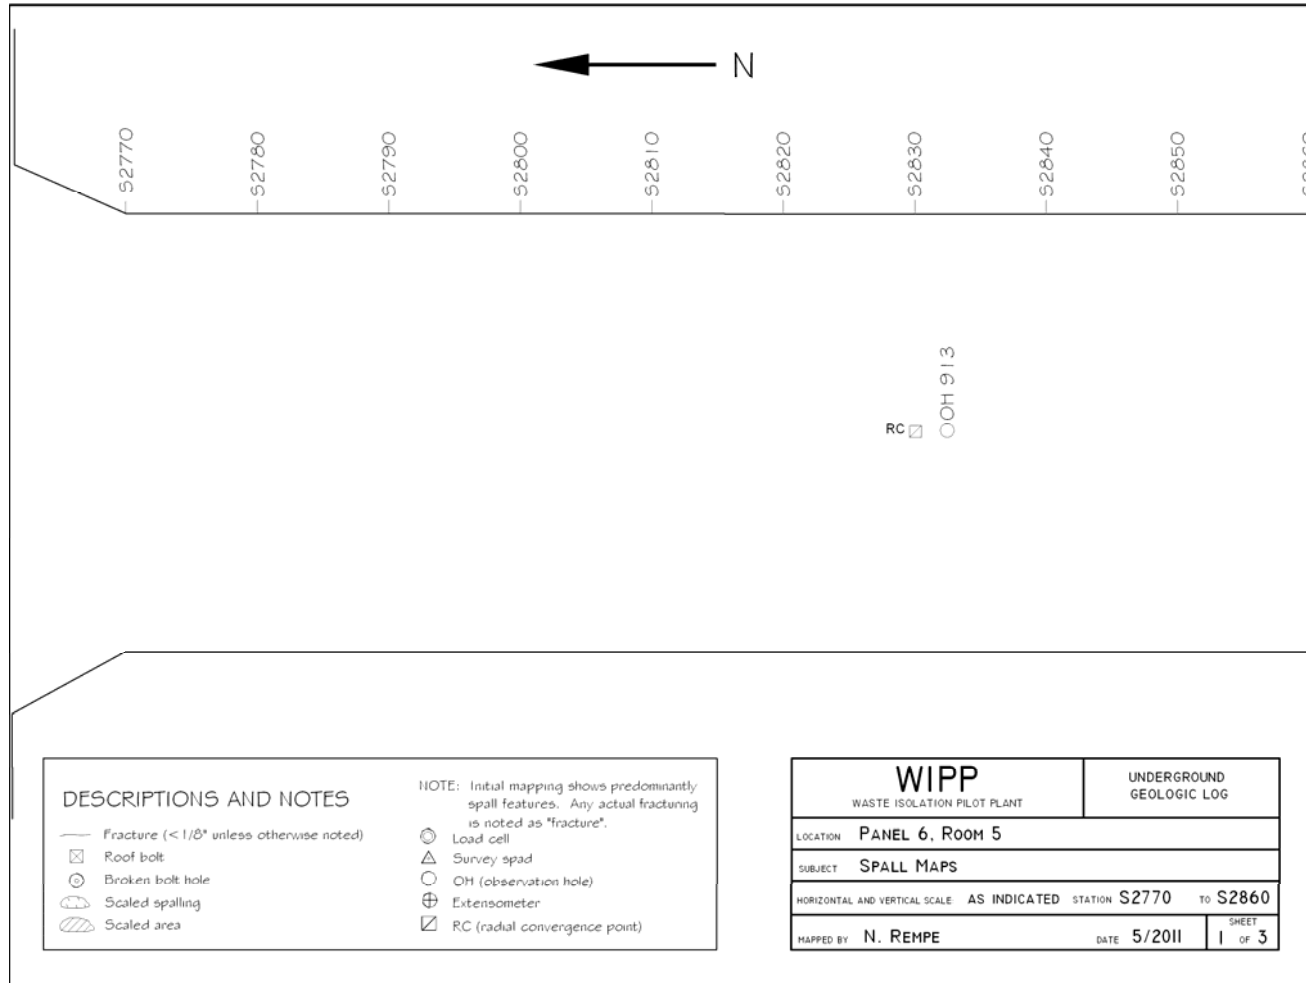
Panel 6 Room 5, S2770-S3060 Roof Fractures (Sheet 1 of 3)
